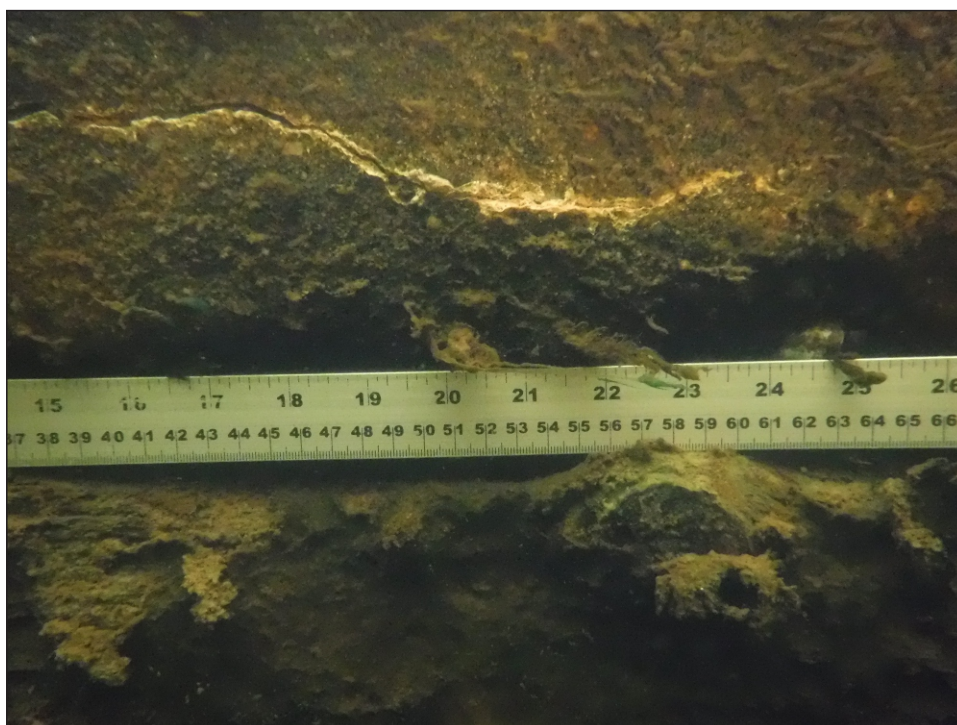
Horizontal crack, west side of Rest Pier
